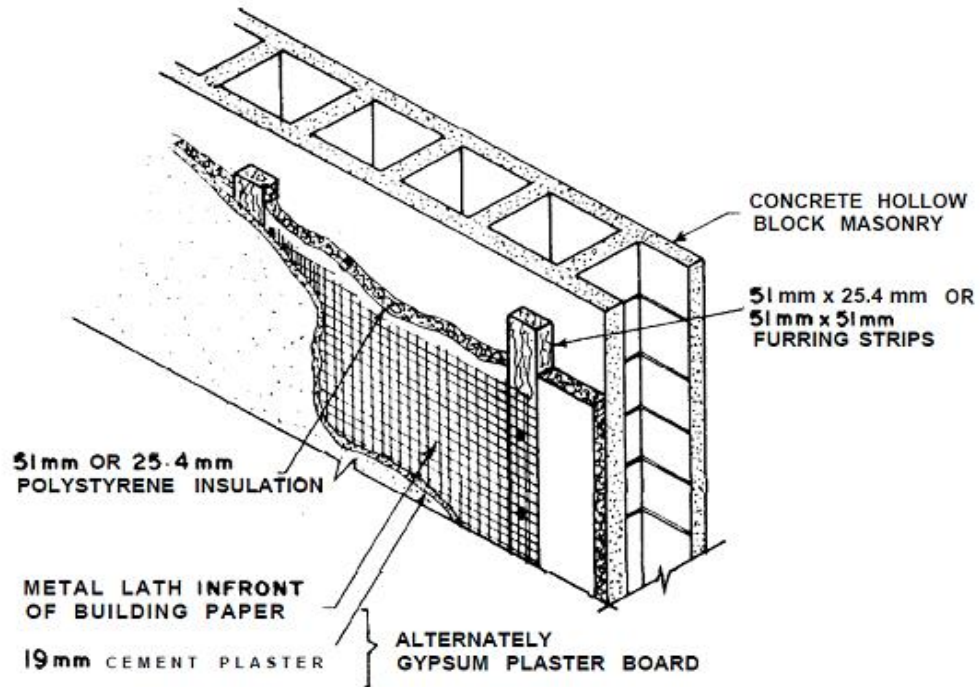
Hollow concrete block wall with polystyrene insulation.
